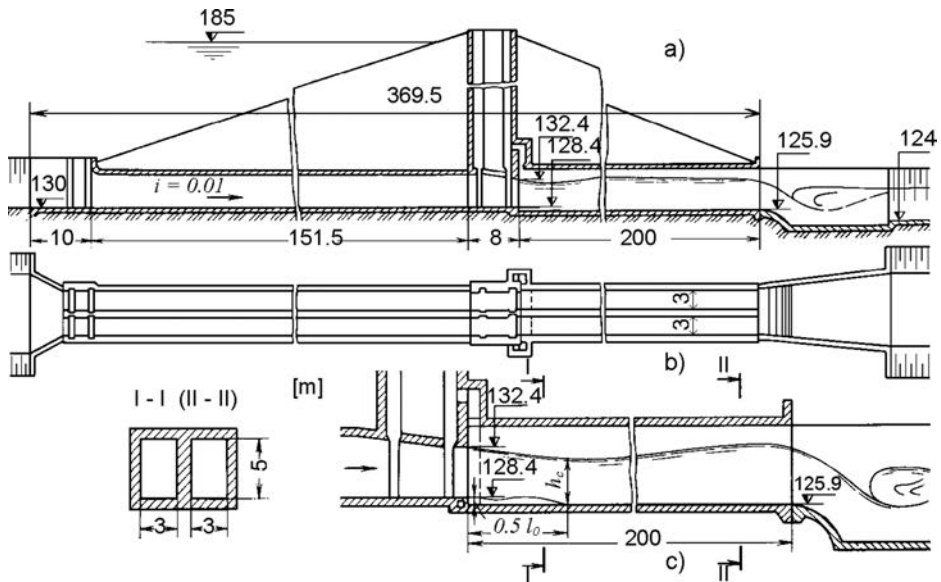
A bottom outlet structure in form of a gallery (after Lapshenkov, 1989).
